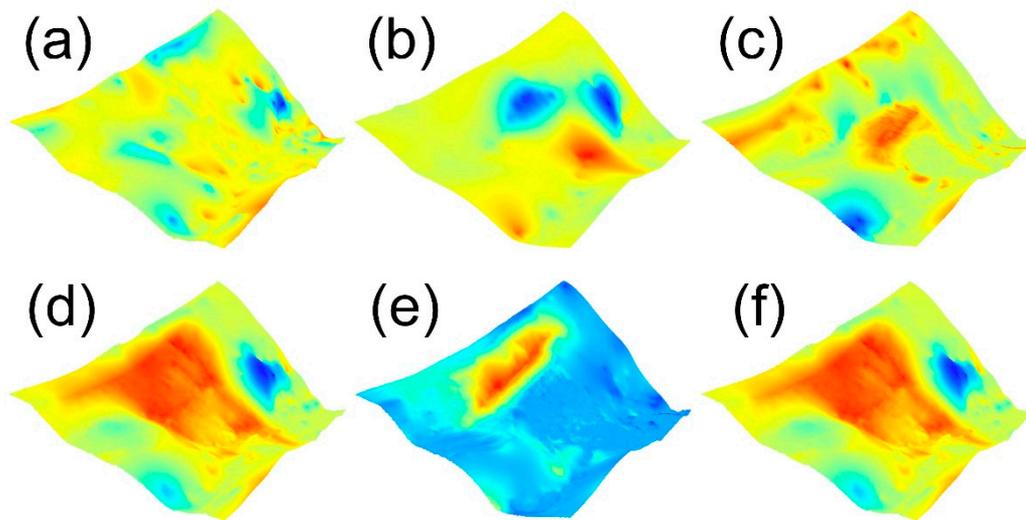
3D model of the earthwork sections at each stage. (a) constructing an access road to the lower part of the embankment and the formation of the base, (b) forming the embankment base by earthwork and logs, (c) forming the lower part of the embankment by earthwork and logs, (d) forming the upper part of the embankment by earthwork and logs, (e) shaping the entire embankment, (f) overall earthwork.
